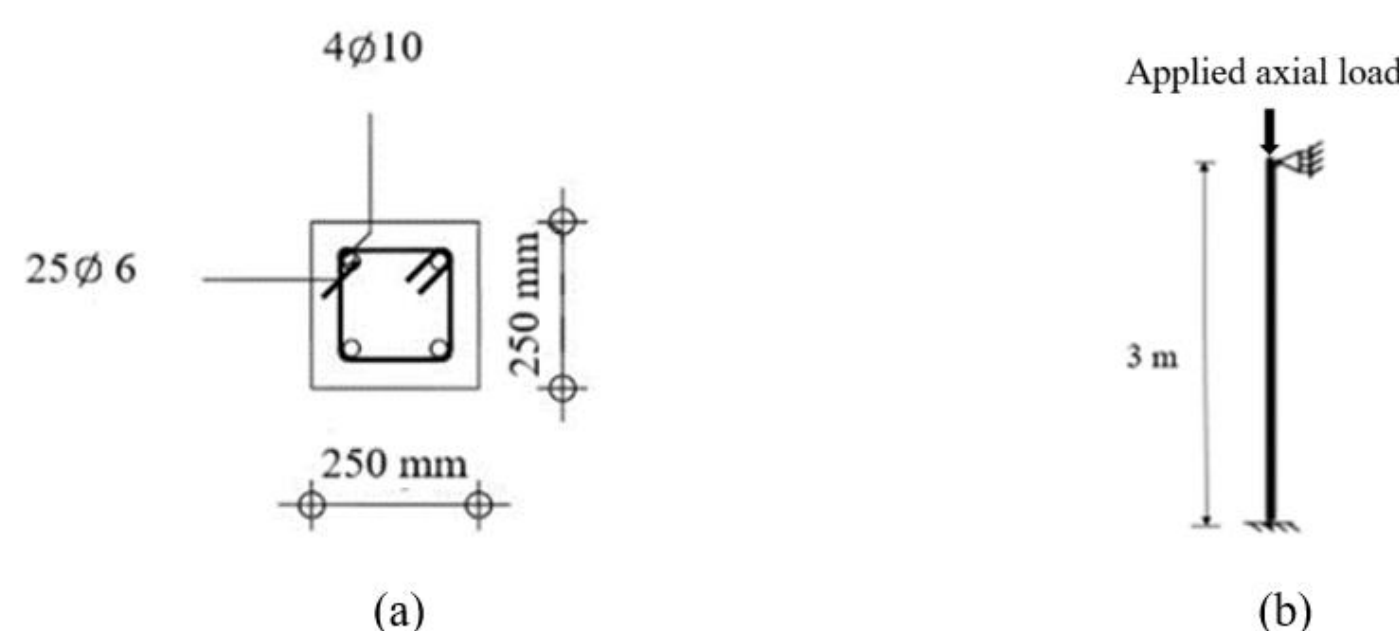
Details of the studied columns (a) Cross-sectional details and (b) Boundary conditions and loading.
